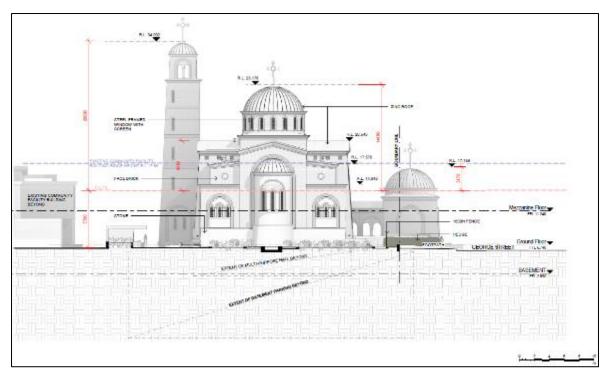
Eastern Elevation (Source: Design Delta Architects)
